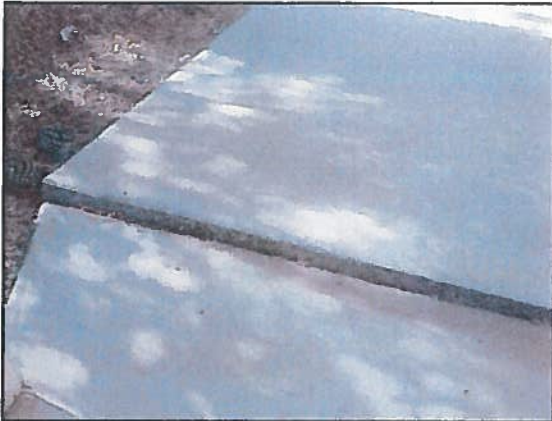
Fire Station 4 – Heaving walkway slab on west side of building
